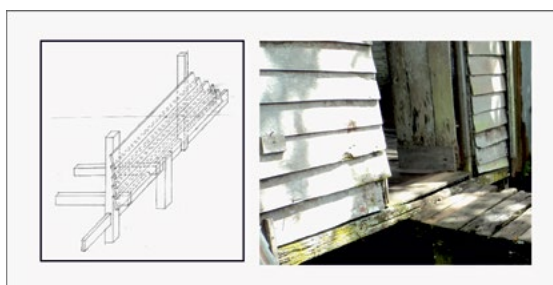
The wooden board attached to the columns or beams with a clapboard system – *sistem susun sirih* (photograph was taken from the outside of traditional Malay house in Sambas town).
